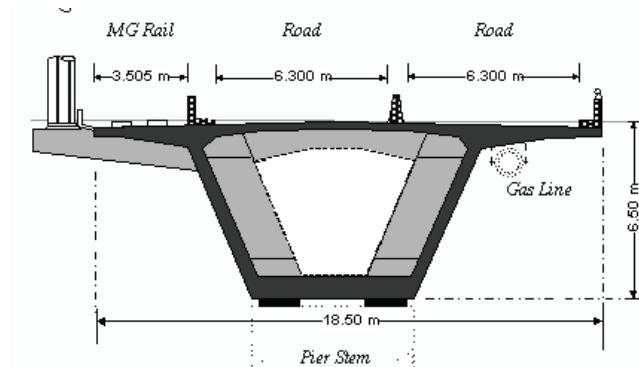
Cross section of the Bridge ([www.citechco.net/jmba/bridge.html](http://www.citechco.net/jmba/bridge.html))
